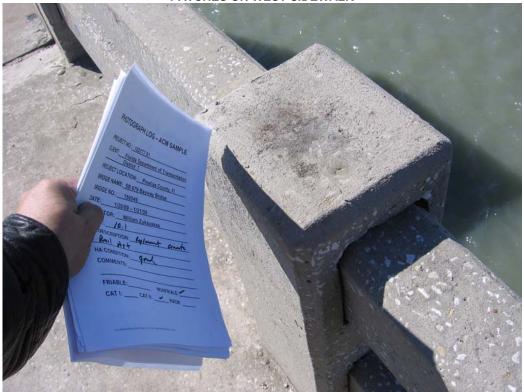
01/21/09 - SAMPLE 10.1 - HA 10 CONCRETE REPLACEMENT RAIL POSTS
